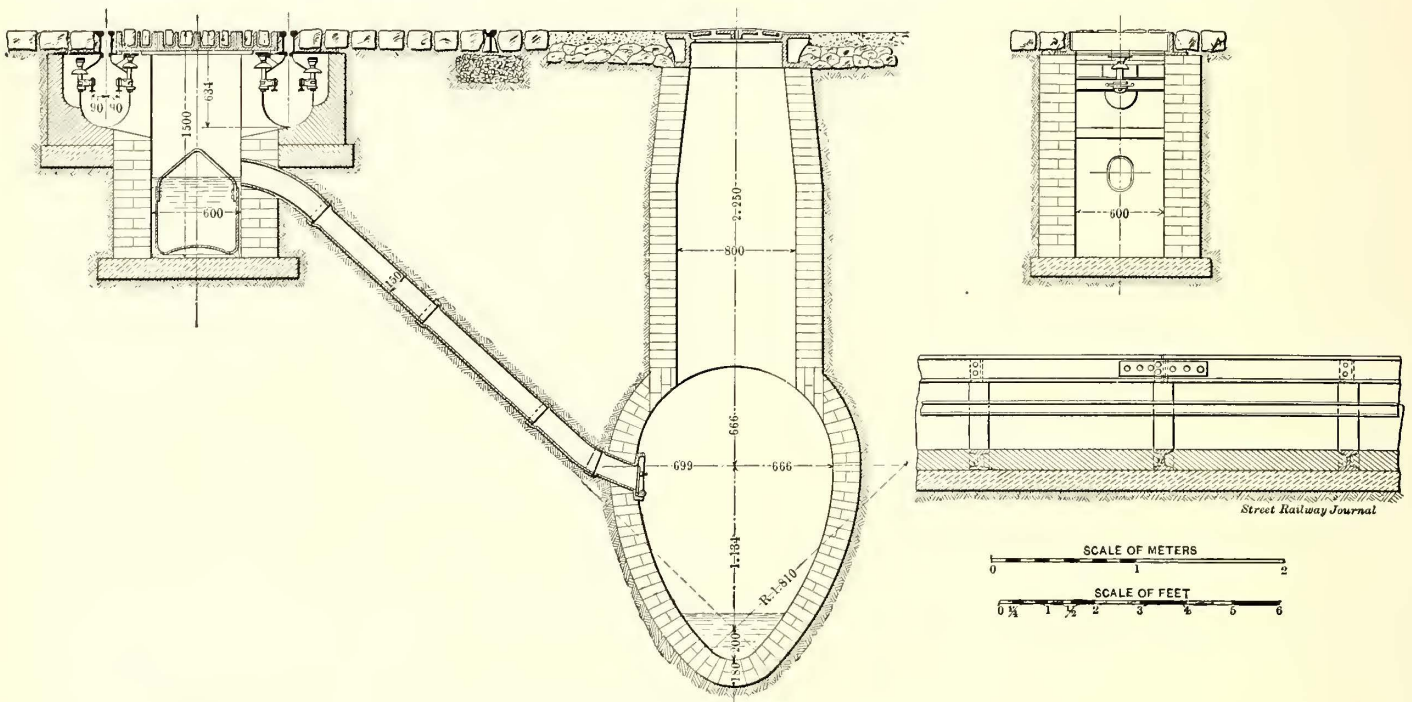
SECTION OF CONDUIT AT A MANHOLE
